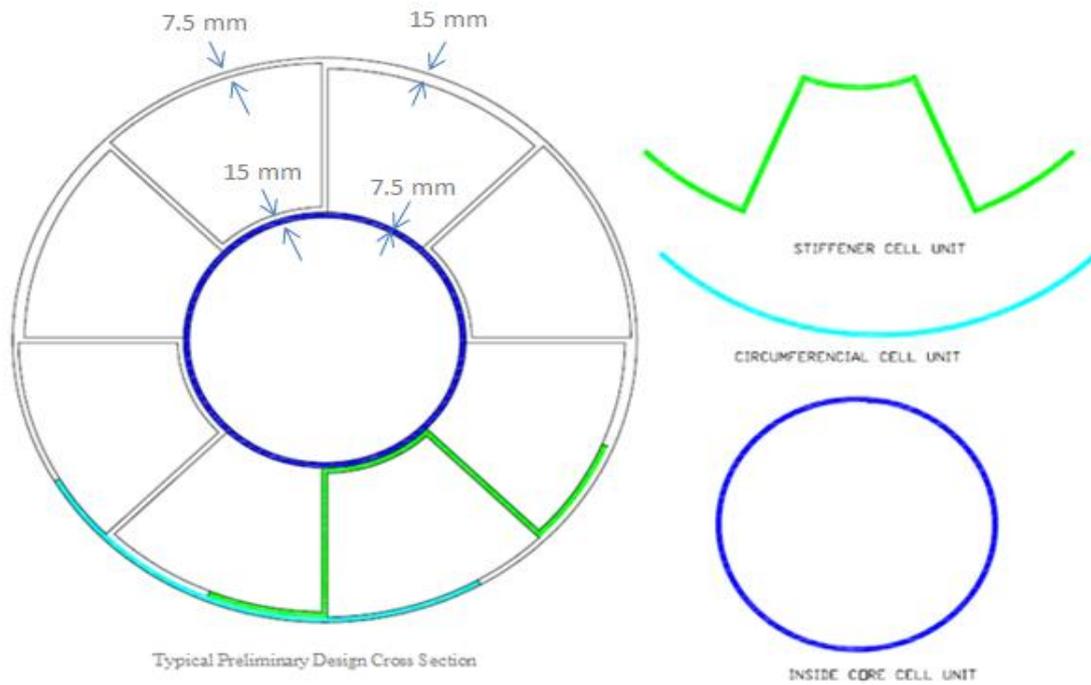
Conceptual fabrication drawing of the proposed design section
